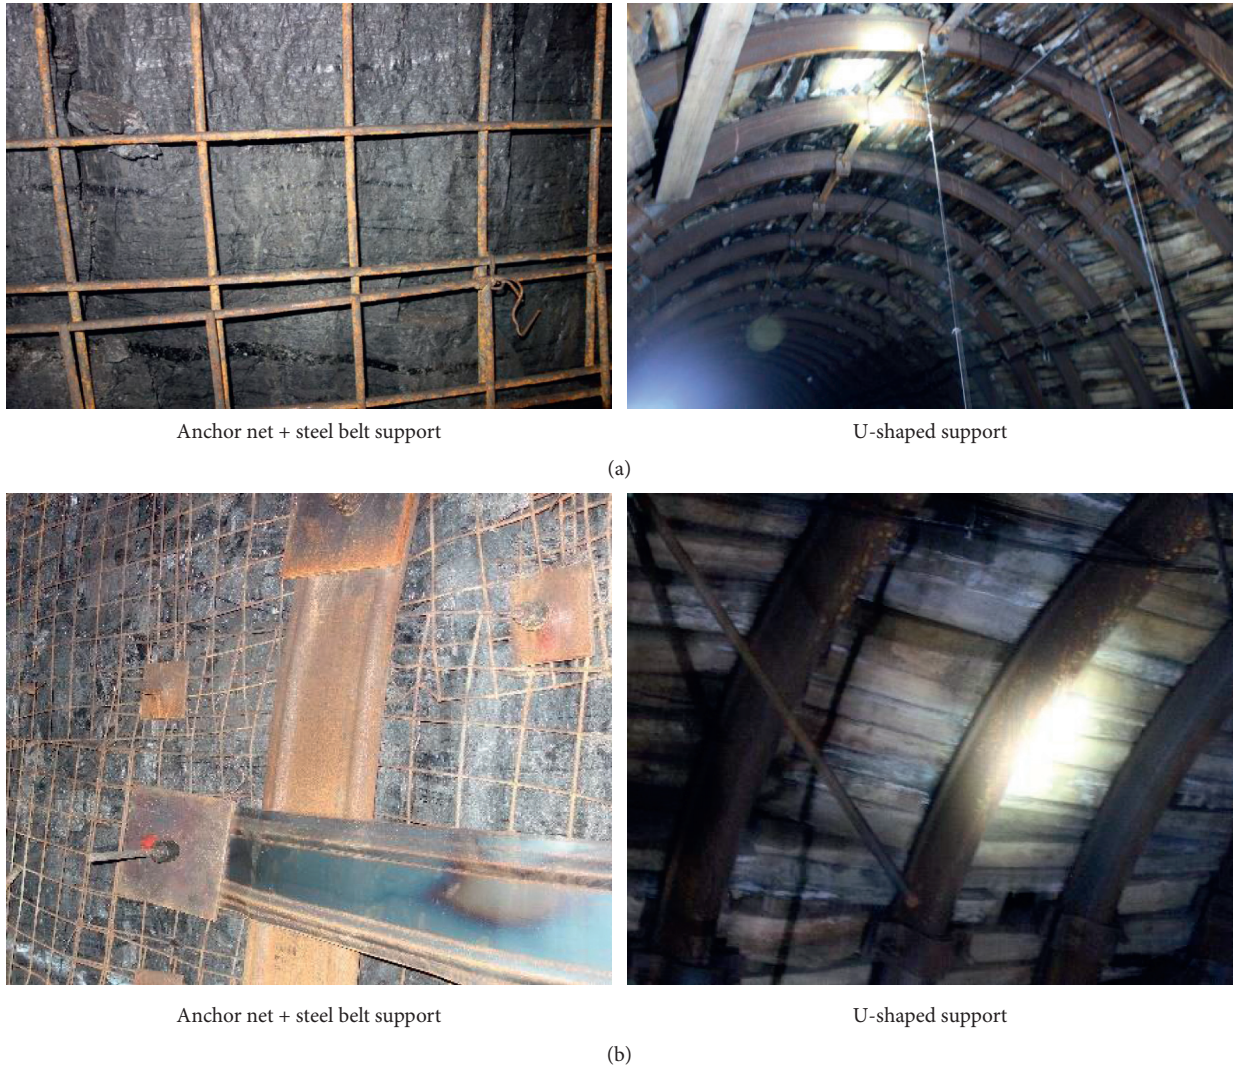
Coal wall failure in monitoring points. (a) The first group. (b) The second group.
